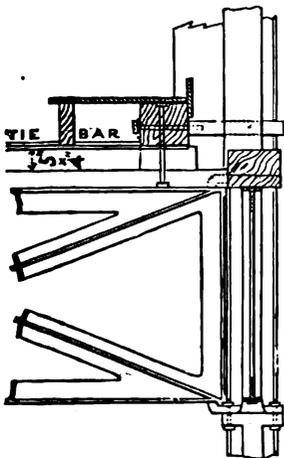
Detail of the Foot of Arched Rib on Column, and adjoining parts.
